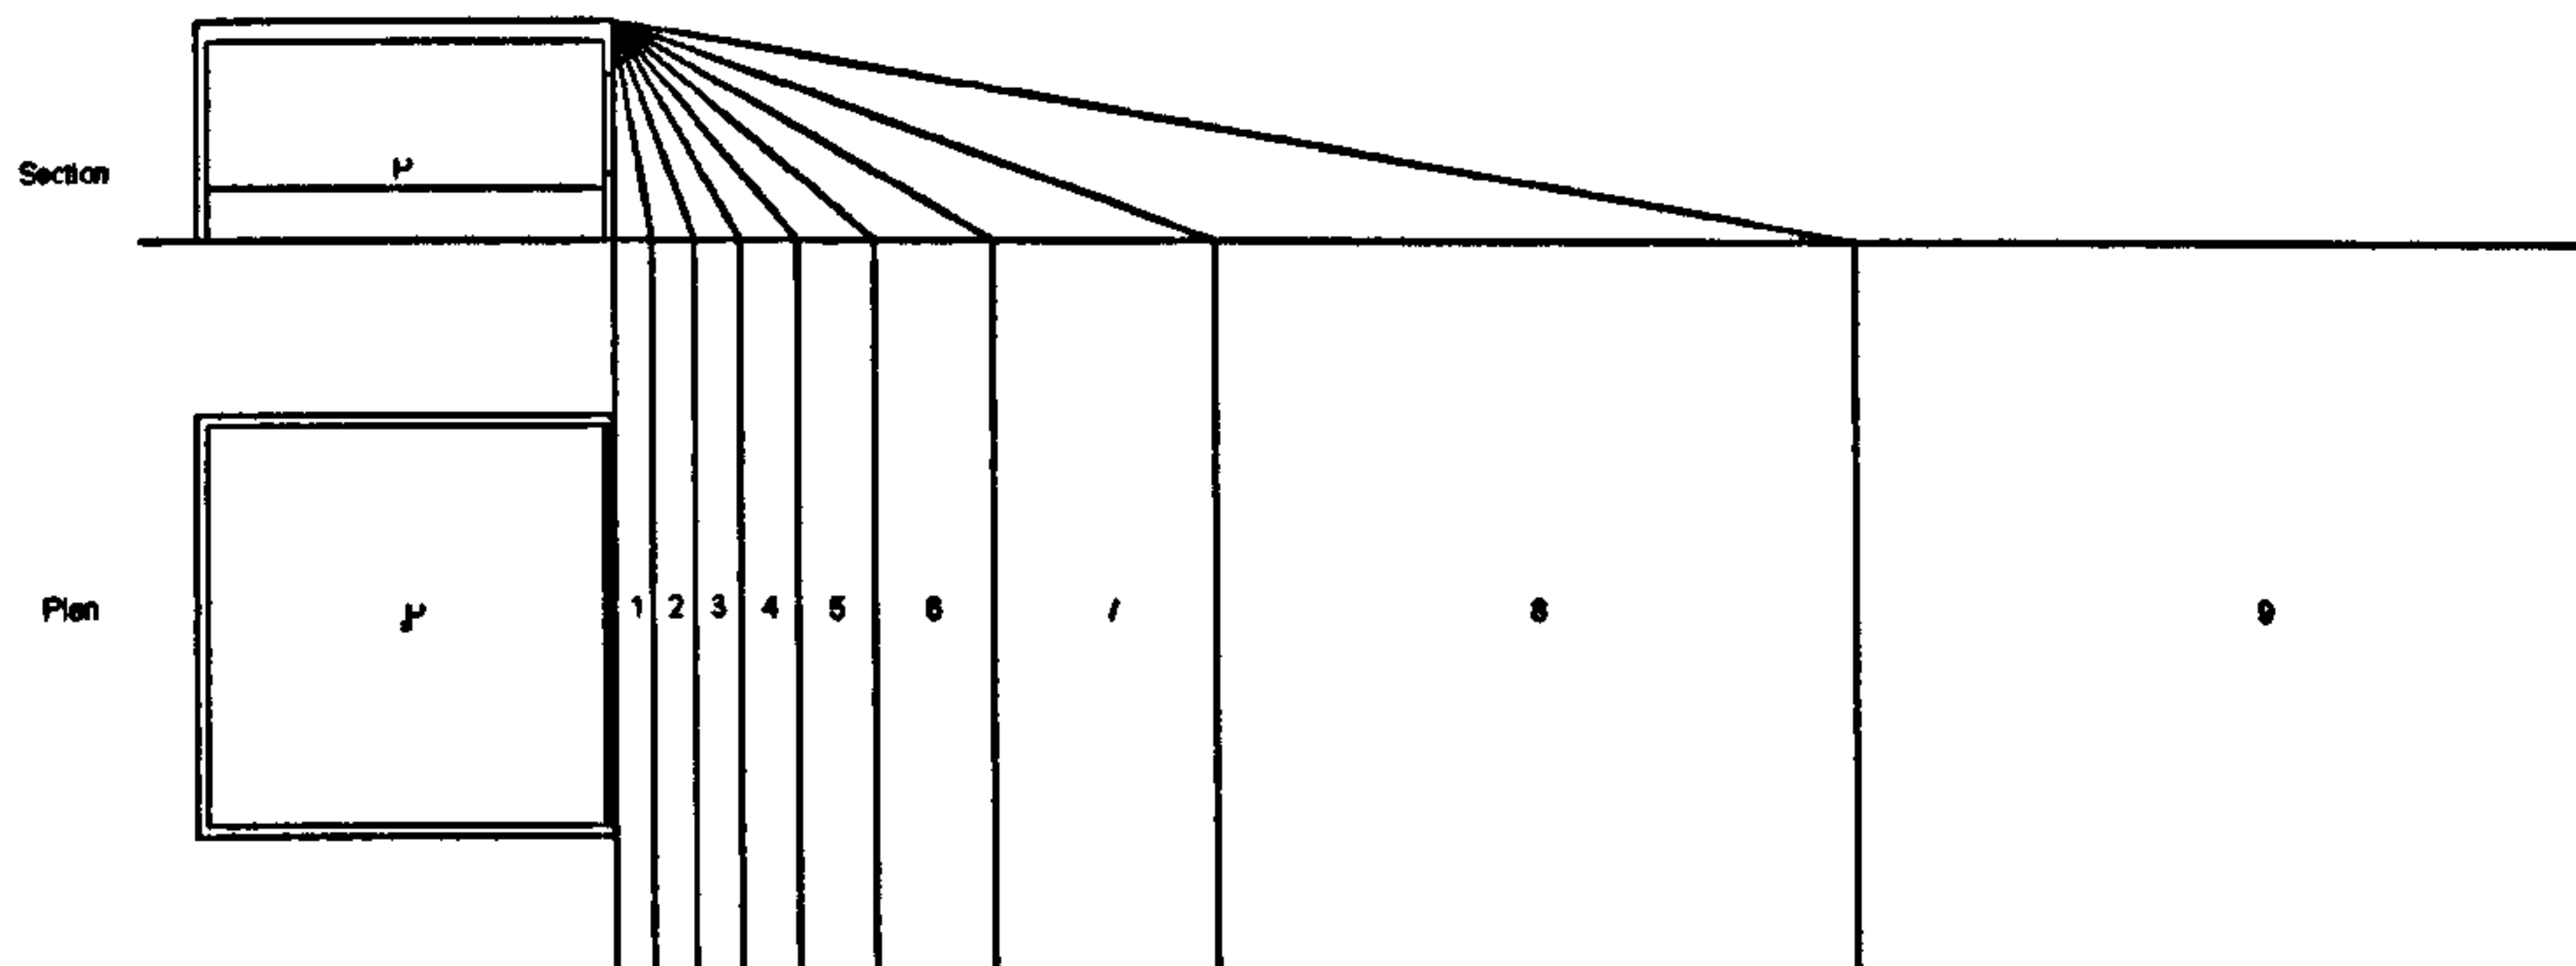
Ground subdivision - strips parallel to window facade defined by angle
